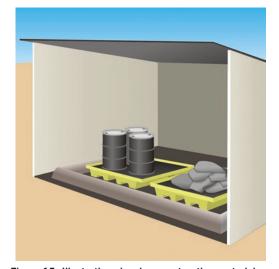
Illustration showing construction materials with secondary containment and overhead cover to prevent stormwater contamination.
